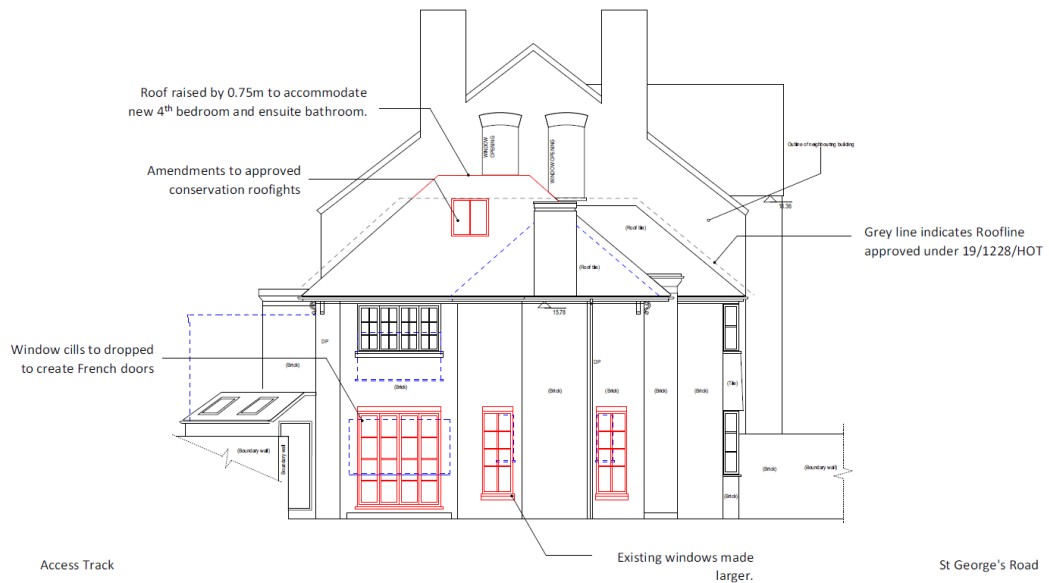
Proposed side elevation showing the wholly minor increase in ridge height at the application site and the way in which the building remains subservient to the neighbouring property
